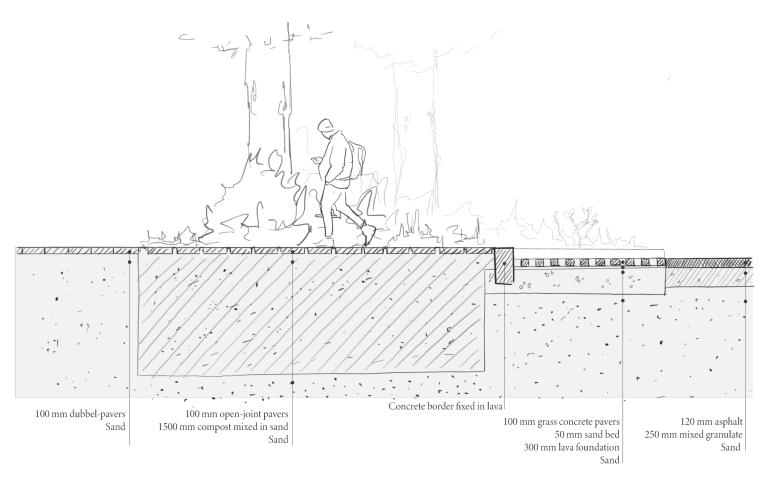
Section AA. open-joint pavers to reach from the parking spots to the sidewalk.
